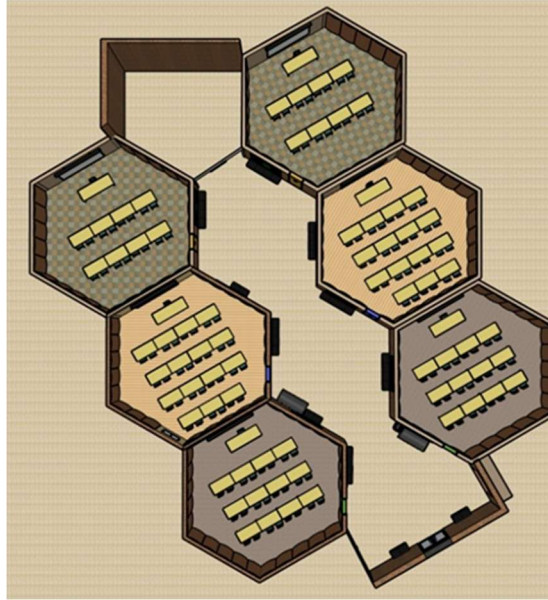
Top-down floor plan of the virtual study environment showing hexagonal room configuration
